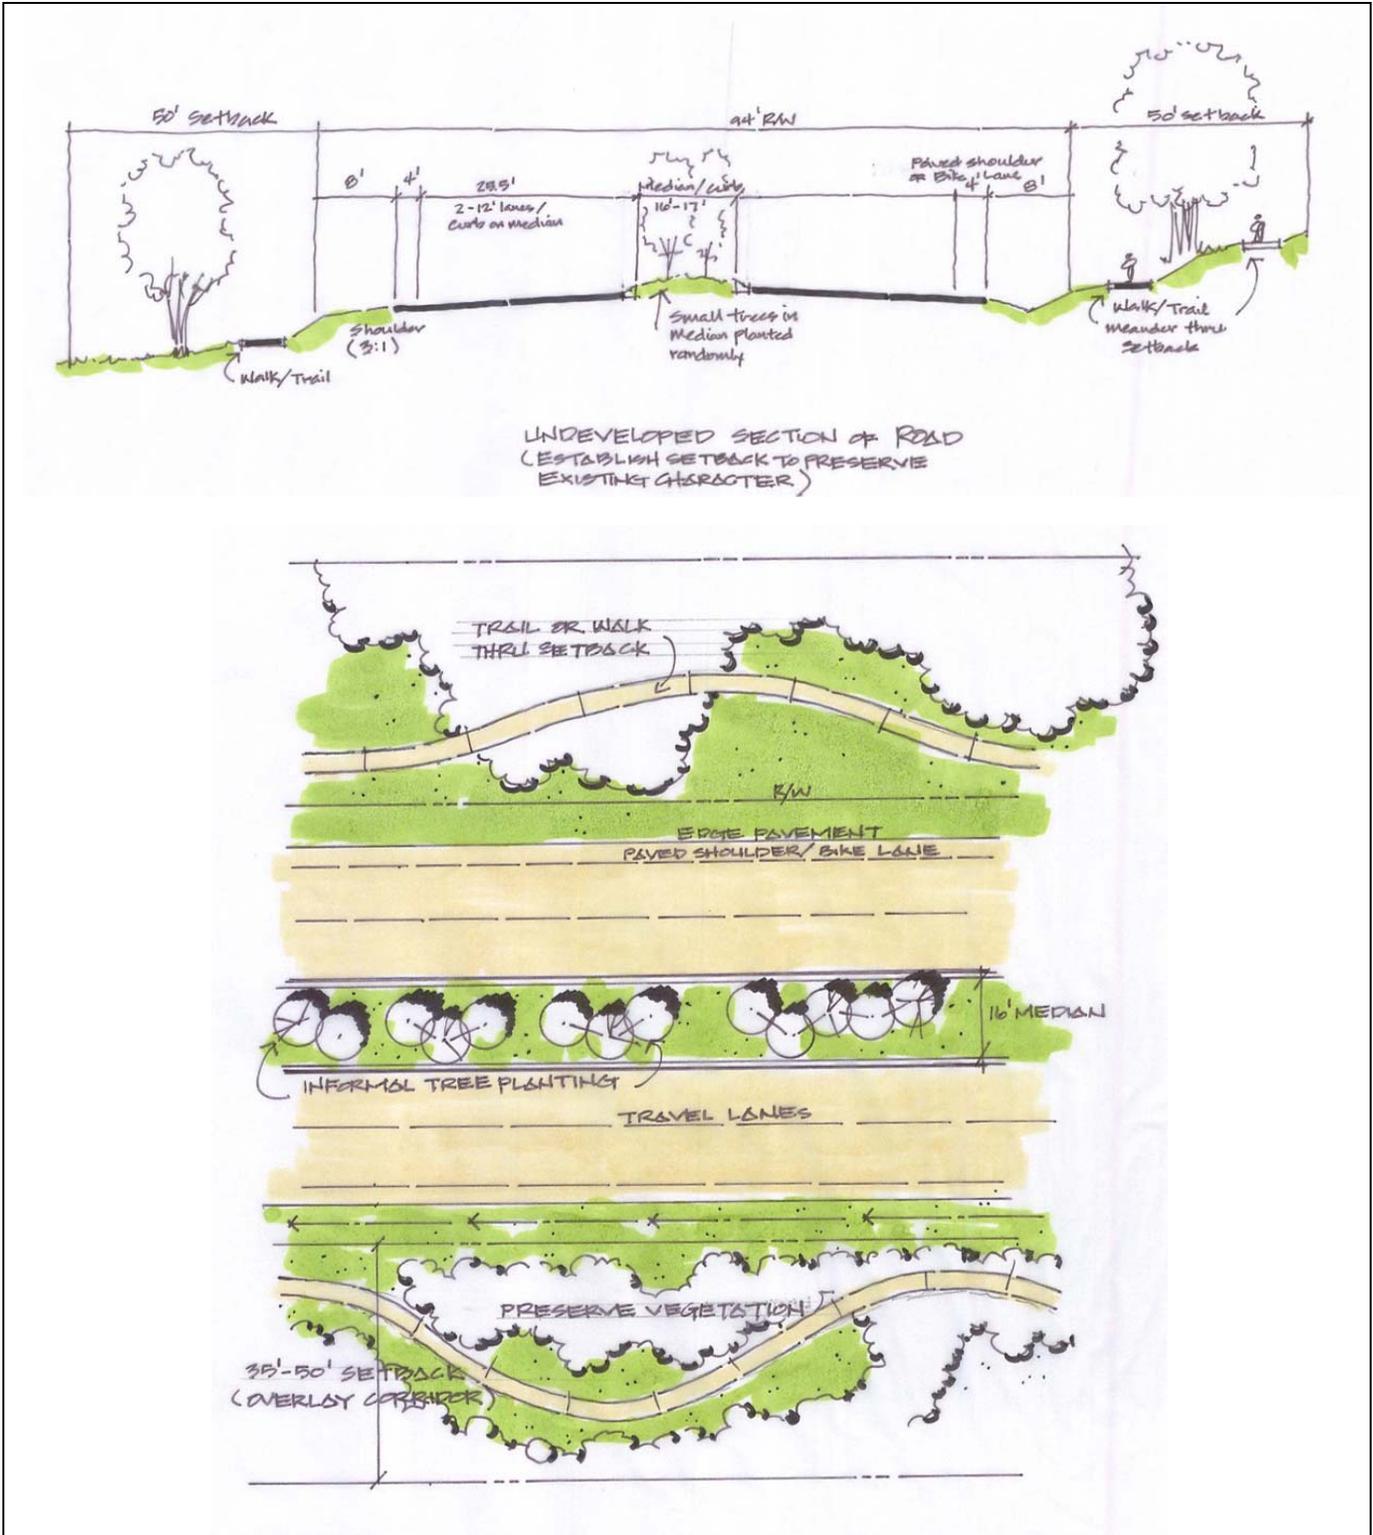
"Undeveloped Section of Road," above, depicts a hypothetical four-lane road section through undeveloped portions of the Harrisburg planning area. On-road bike lanes are shown in addition to a sidewalk or multi-use trail in a buffer parallel to the right-of-way. The buffer and trail could be secured as a requirement of major land development approval to mitigate the impact that large new subdivisions might have on the rural character prevailing in the southern portion of the planning area.
